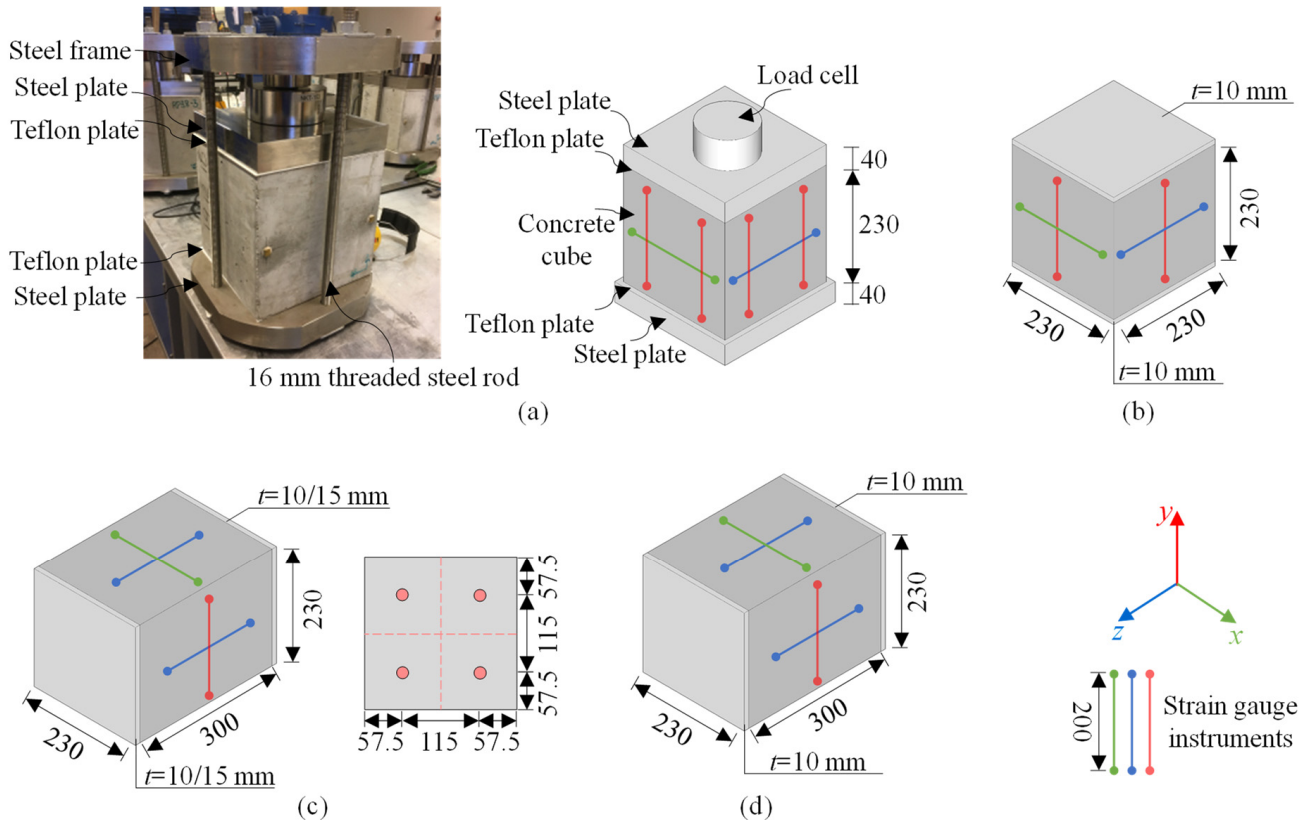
Specimen design (unit: mm): (a) LoadCube samples; (b) free expansion cube samples; (c) RcPrism samples and cross-section; and (d) free expansion prism samples [20].
